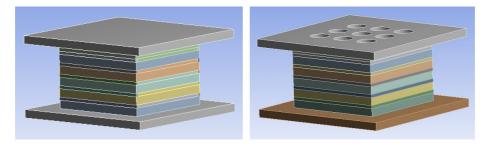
Simple elastomeric bearing and elastomeric bearing with holes.
